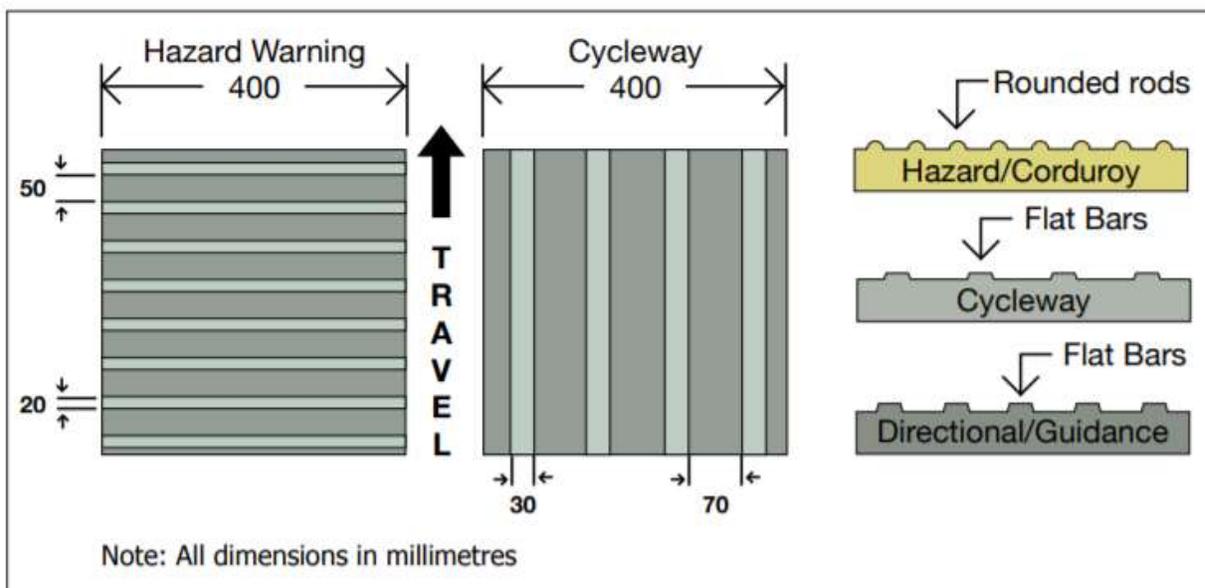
Examples of Hazard Warning and Cycleway Paving (Note: Extracted from NDA *Building for Everyone: A Universal Design Approach*)
